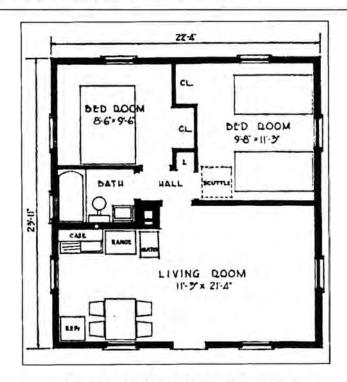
FHA Plan A floor plan, 1936 (Both drawings from Ames & McClelland, pp 60 and 61) Figure 2: FHA Plan A elevation, side gable entry, 1936
